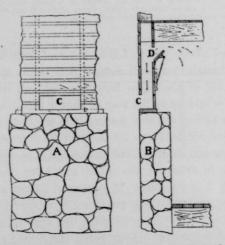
Front elevation and cross section construction of a fresh air intake in a half stone or brick wall, A and B. This method may also be installed in an old barn. If an old barn has a full wall, four such openings could be cut away in each wall. The exterior flue opening, C, and the interior, D, near the ceiling are shown.
